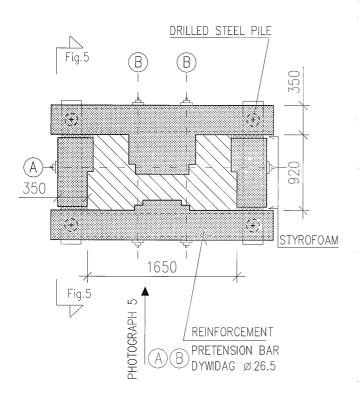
Eastern stair column. Structural stages. Pretensioned concrete mantel and drilled steel piles.
